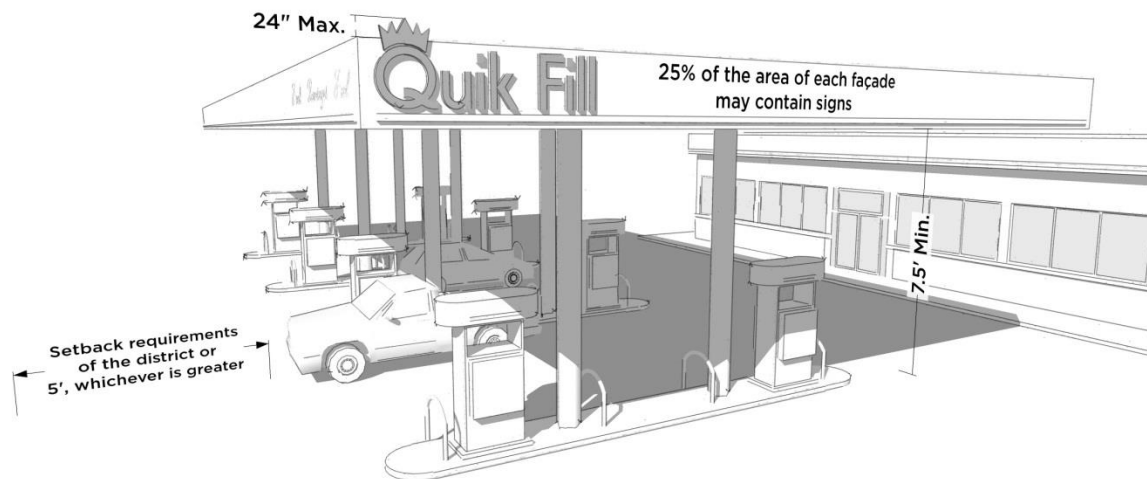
NON-STRUCTURAL CANOPIES
